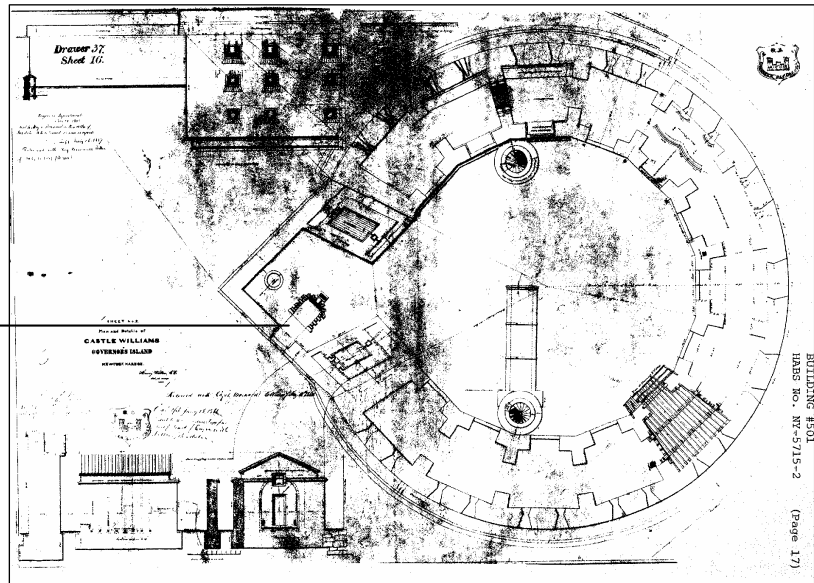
Plan and details of the first tier of Castle Williams, 1839.
